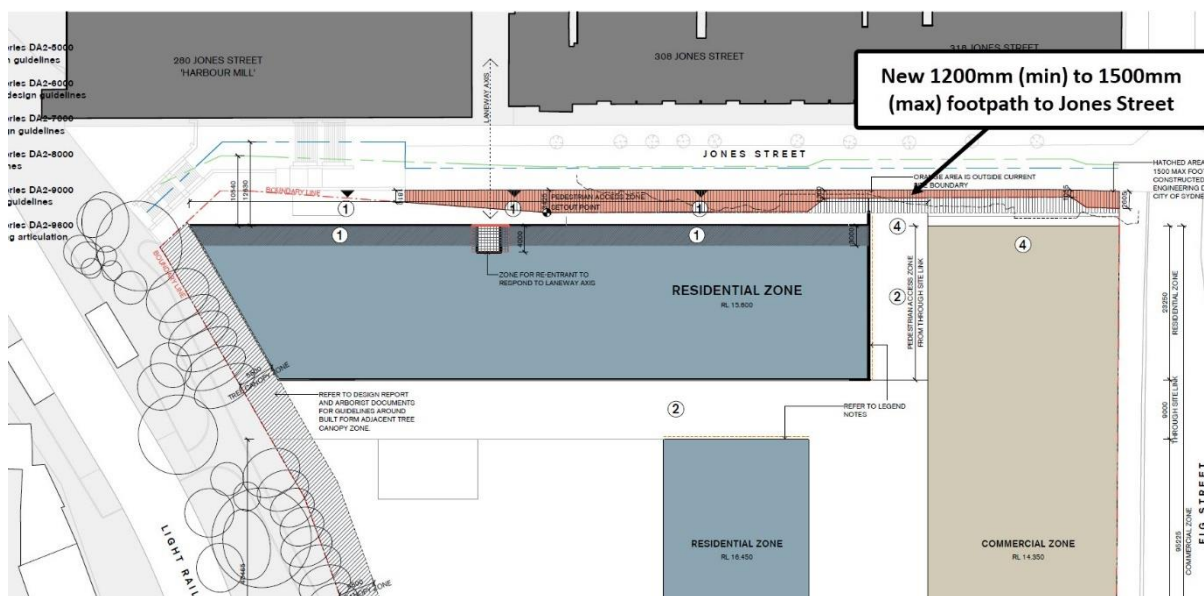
VPA extract showing a plan of the new footway to Jones Street
